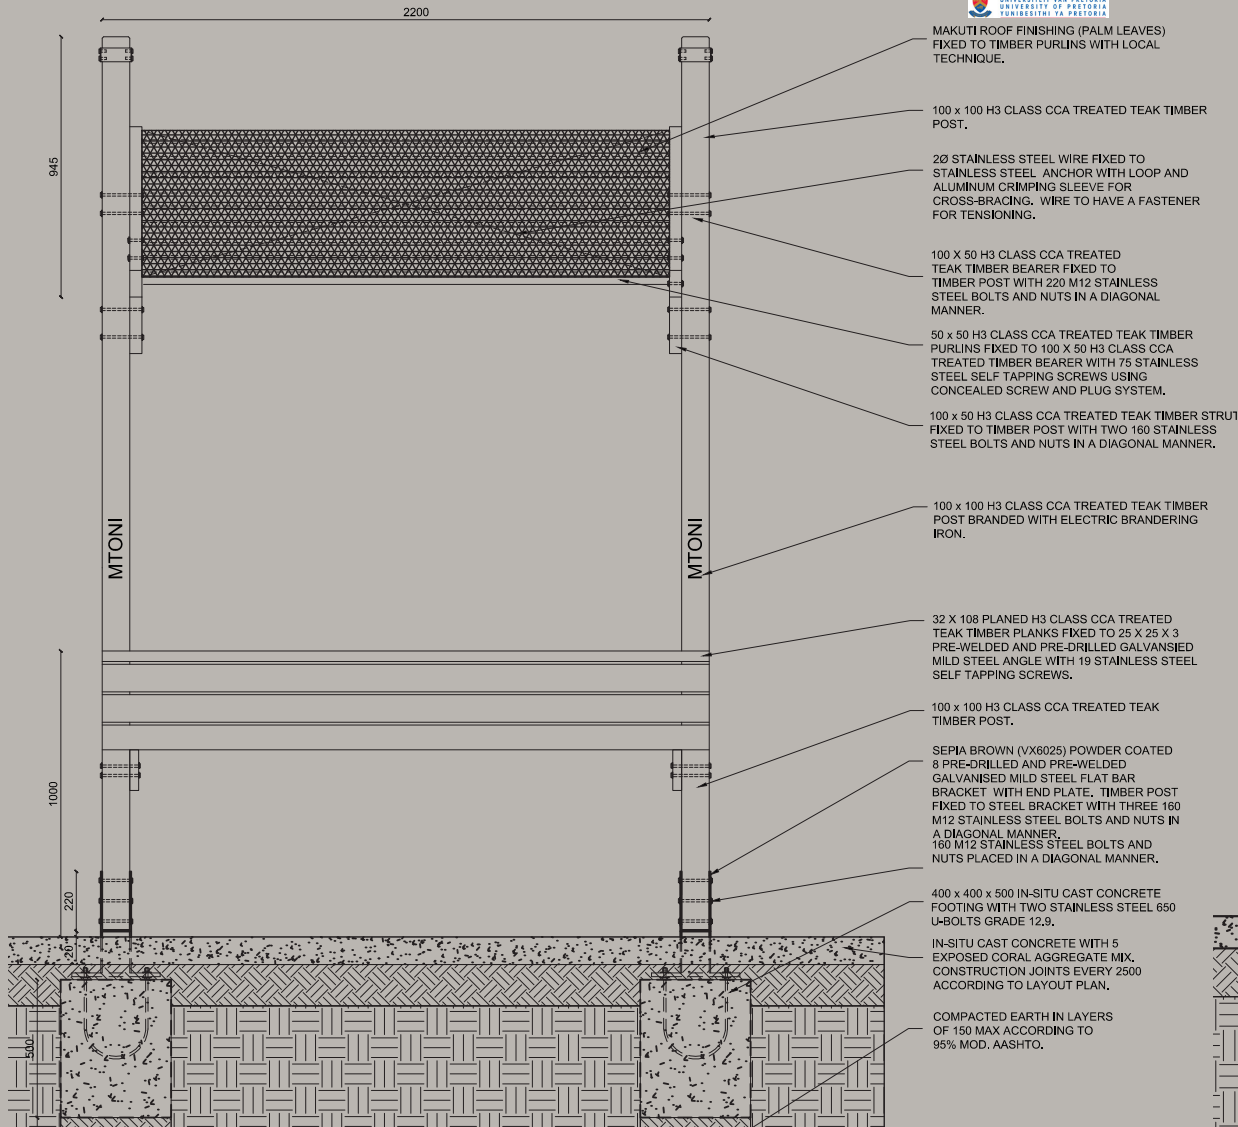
Detail Elevation (1:20) of Market Stand (Author, 2014).
